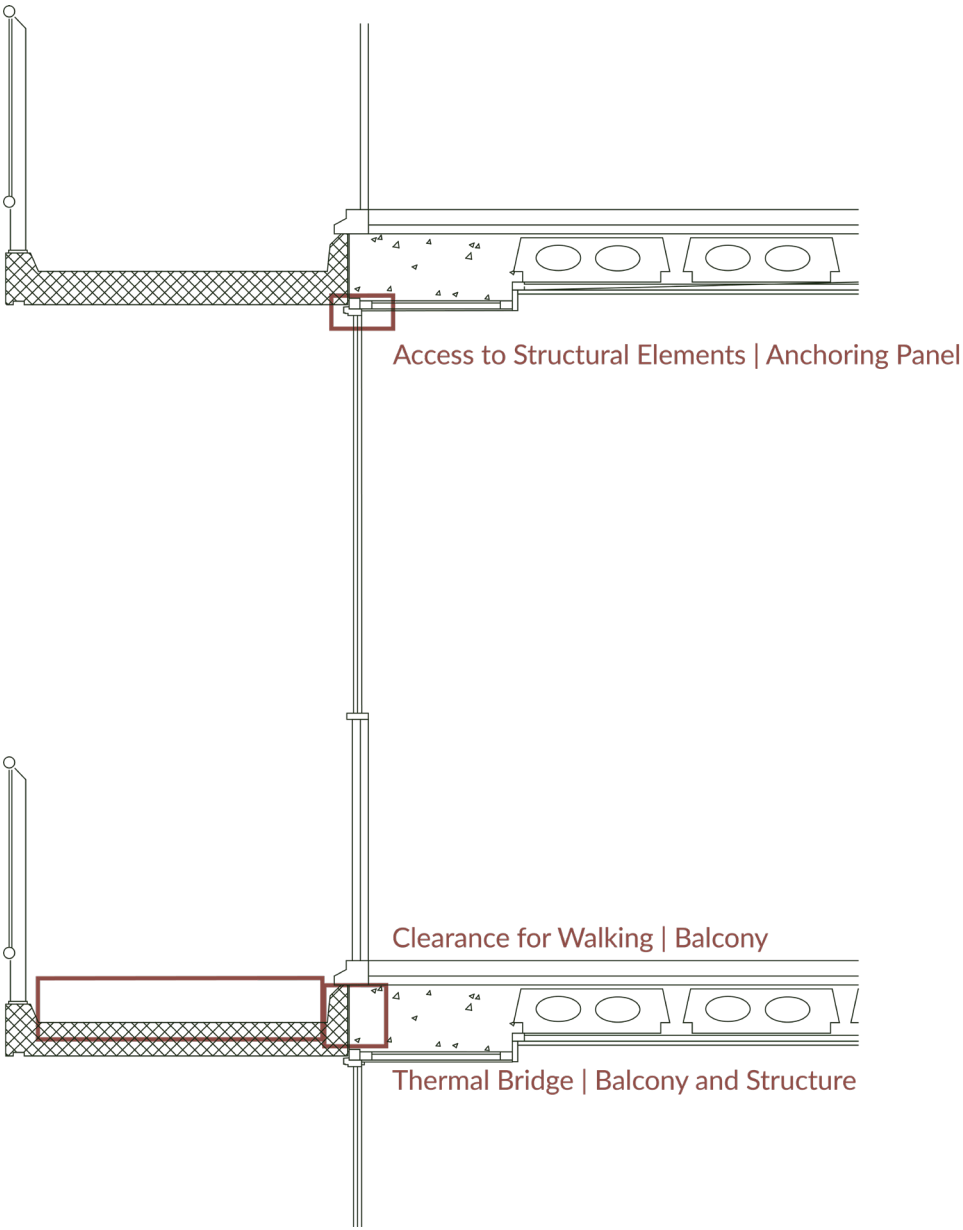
| Identify Challenge Points in the Existing MUWI Construction for the Application of Renovation Panel directly on Facade
